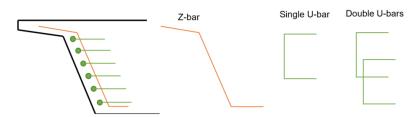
End Reinforcement in the Bent Cap
